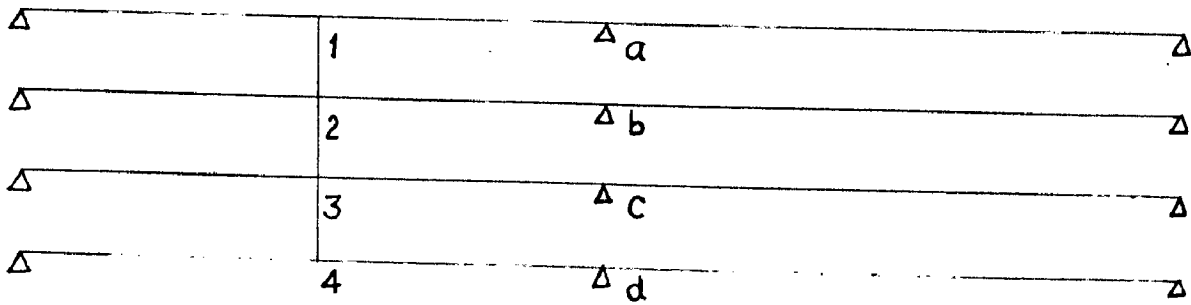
FOUR GIRDER GRILLAGE FIXED AT BOTH ENDS.
